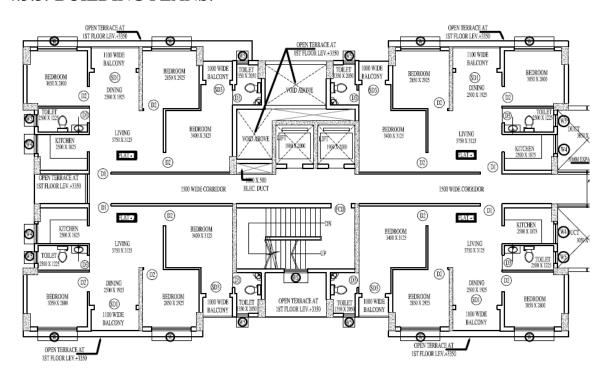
Architectural Plan of Typical Floor of G+12 Storied Buildings
